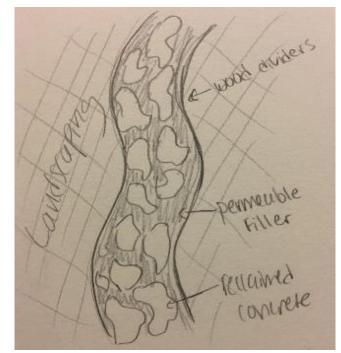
Example of a Reclaimed Concrete Path. Drawing by Ailynn Andersen
